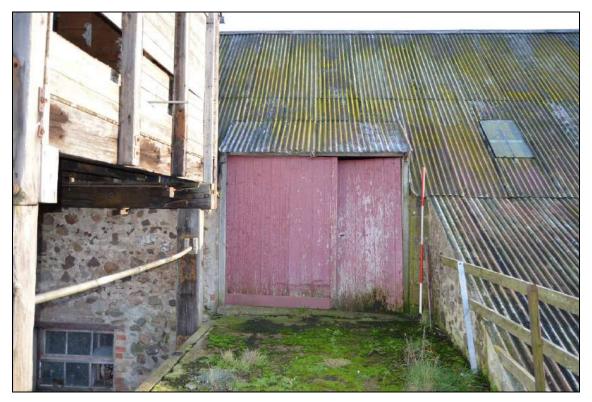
First floor barn entrance to the west elevation of the barn (facing east). Scale 2m.
